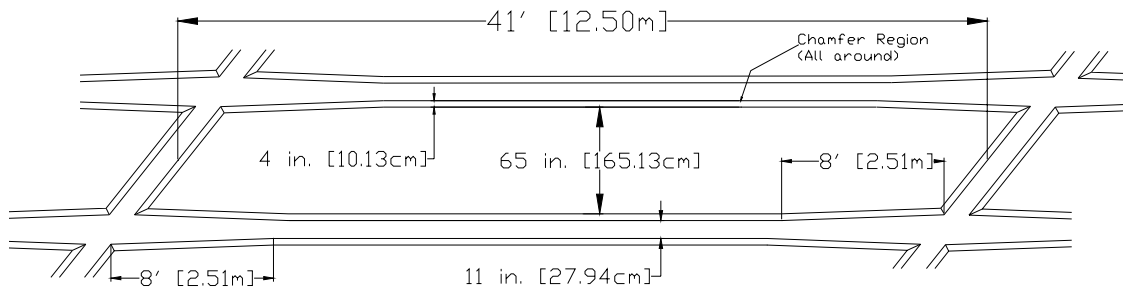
Typical Interior Bay of Watson Wash Bridge
